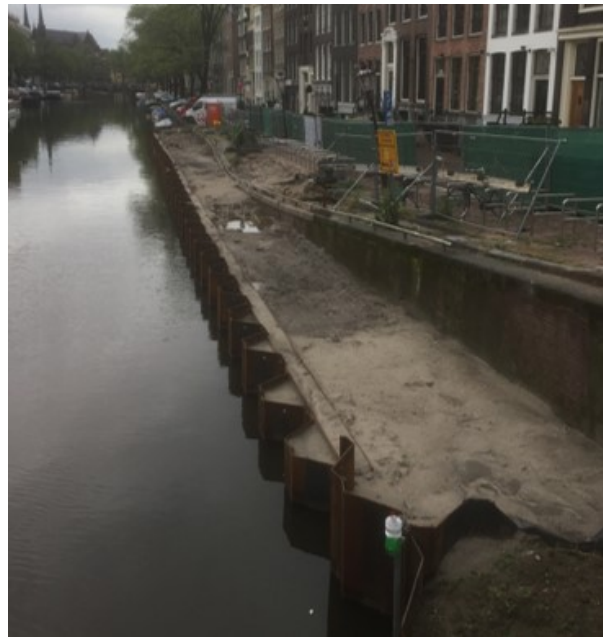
A temporary solution: a sheet pile construction strengthens the quay wall.
